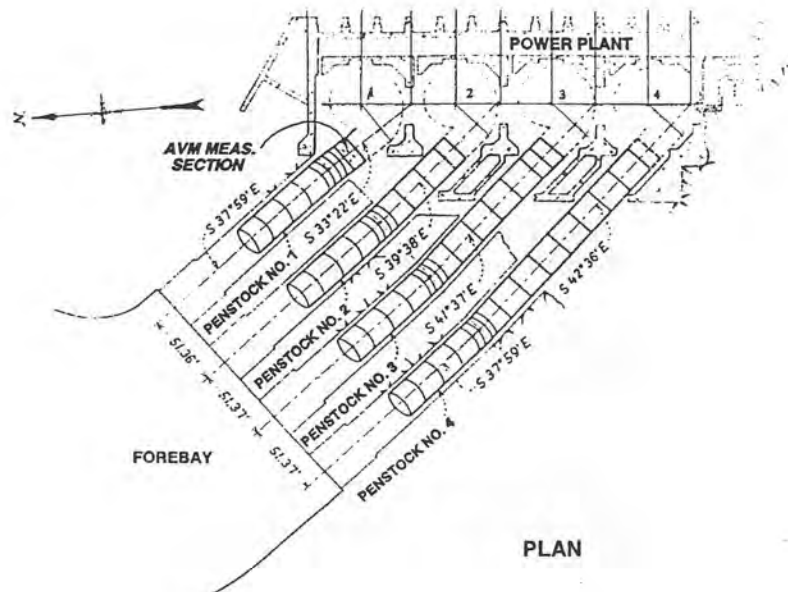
Plan and Section of Penstock and Powerhouse at Parker Dam. For Penstock No. 1, the bend is immediately upstream from the AVM transducer section and has a 12.9° vertical and a 4.6° horizontal angle.
